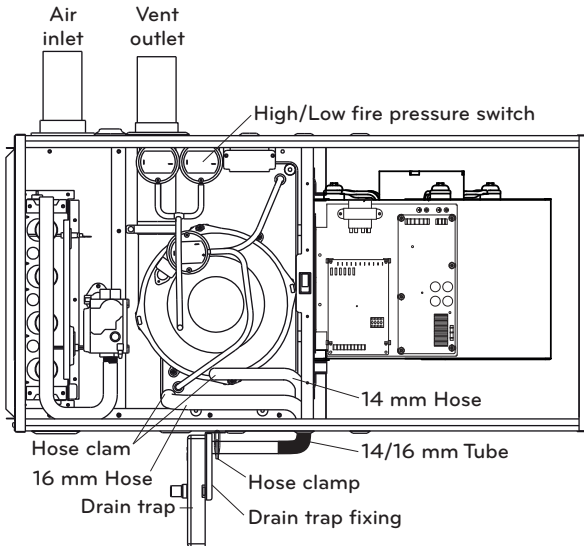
Horizontal Left Side Installation, Vent Through Side Panel
